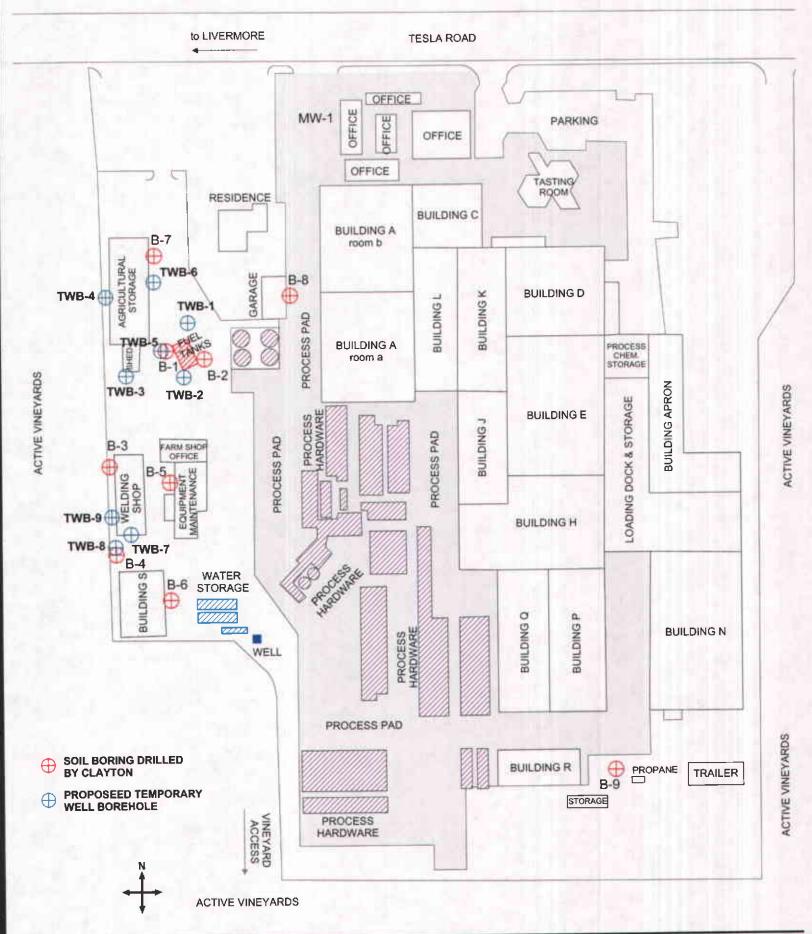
Site map showing approximate locations of proposed temporary well boreholes and previously drilled soil borings.
